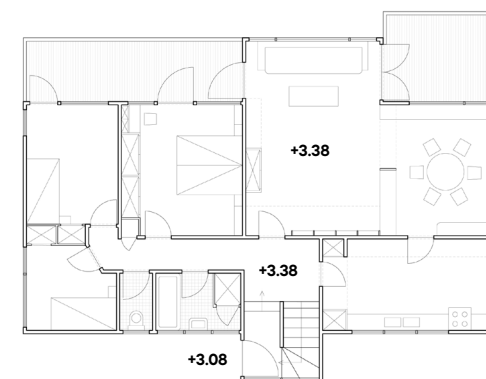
Floor Height in Sharp House (Ground Floor Plan)
